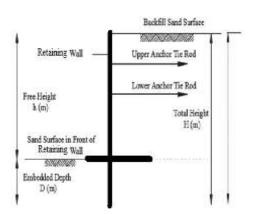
Typical wall section of double anchored retaining wall
